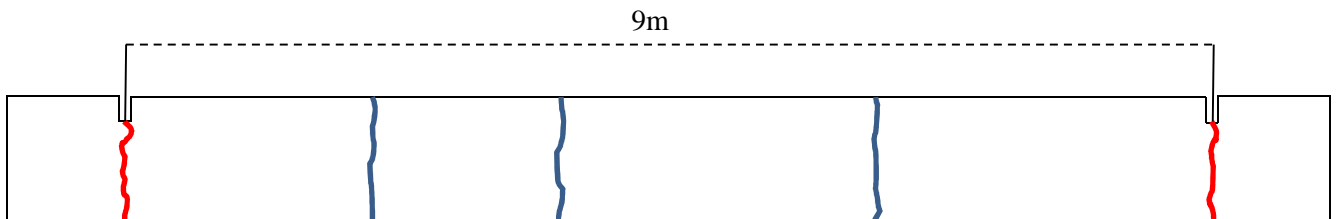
The crack pattern of a 9 m joint spacing slab containing no fibres
